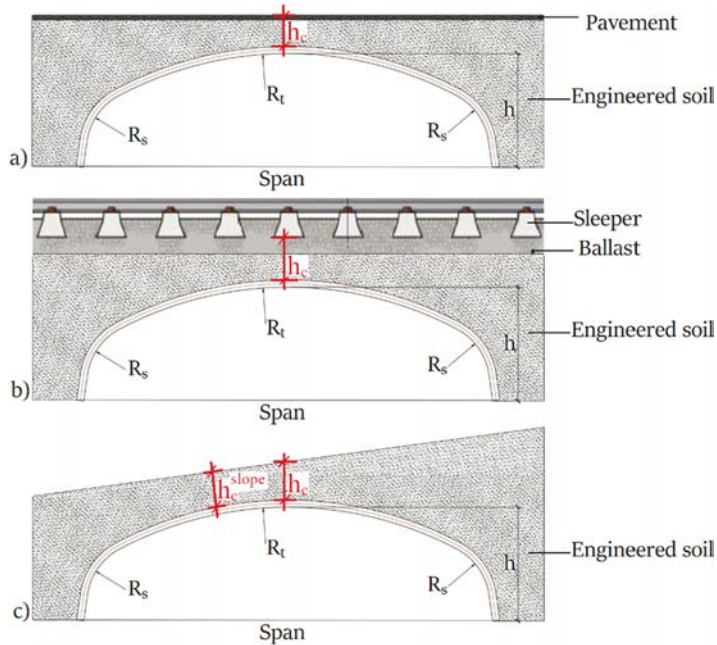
Definition of height of cover for the cases of: a) car traffic pavement on the surface, b) railway road, and c) sloped surface
